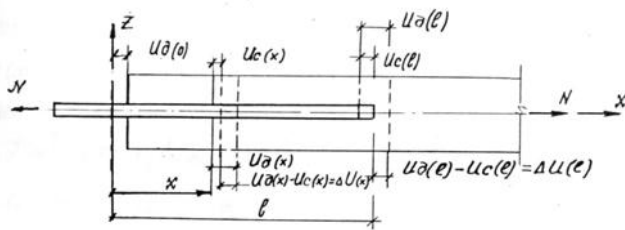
Design schemes of connections on the pasted rods at pulling out of a reinforcing bar.
